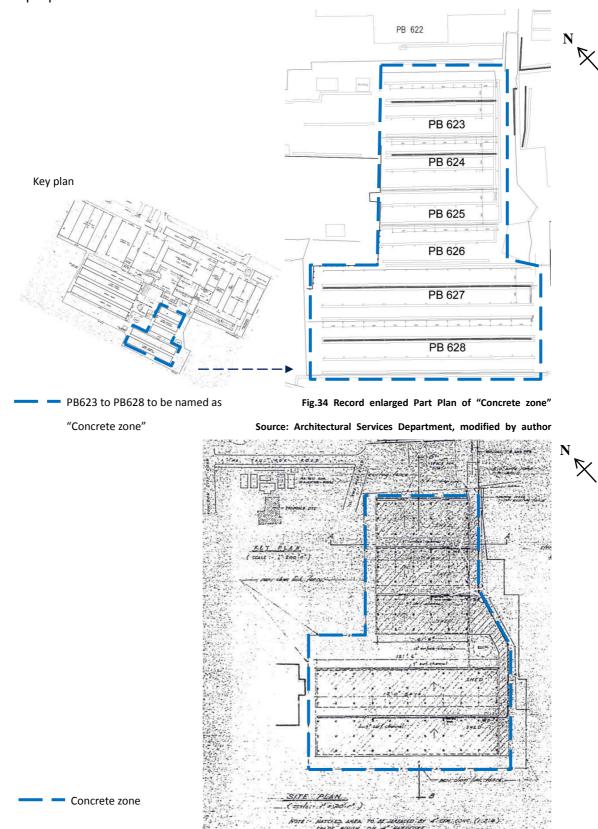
1964 record plan of the cattle depot (with concrete zone highlight in blue)
